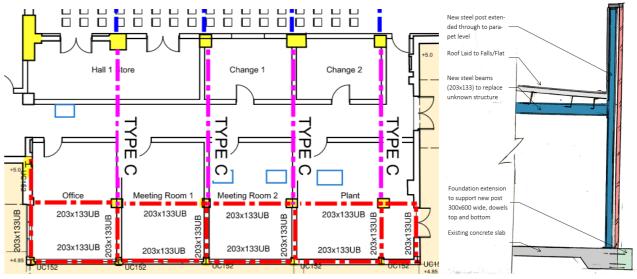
Proposed Roof Structural Alterations (left) and cross section (right)
